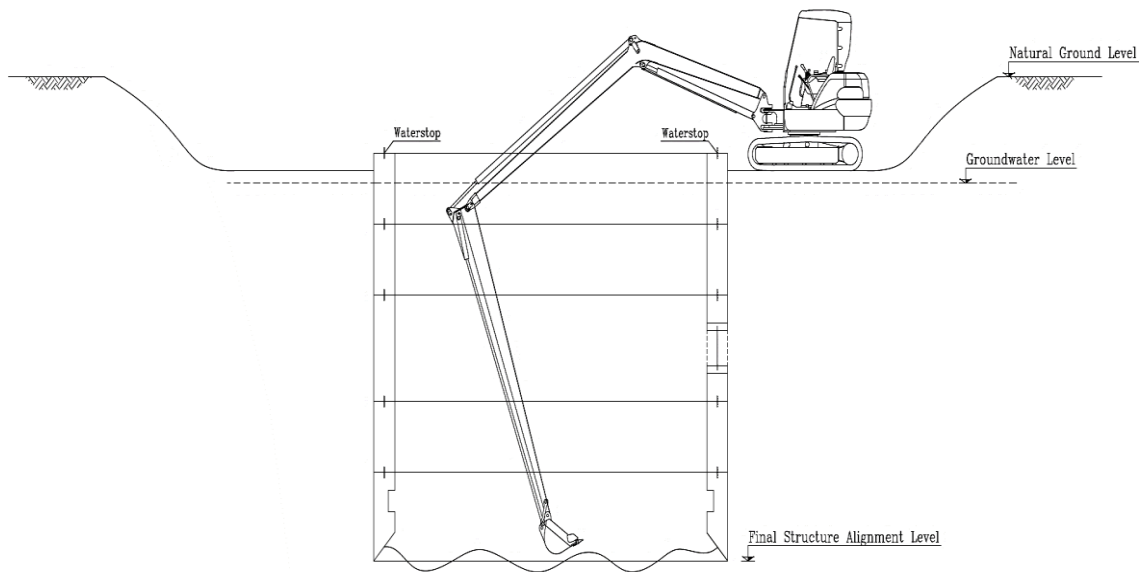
Construction of the next parts of the wall to reach structural foundation level
